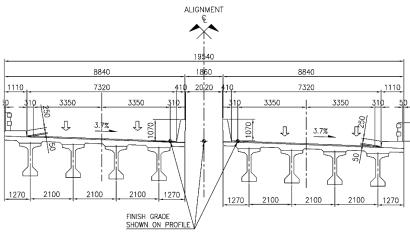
Typical Cross Section of 4 Lane Bridge
